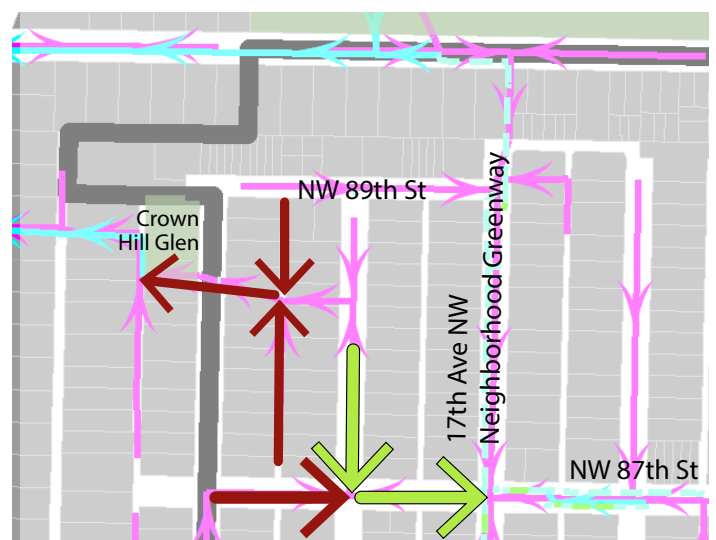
C Option 1C: Add new storm drain collectors and outlet
